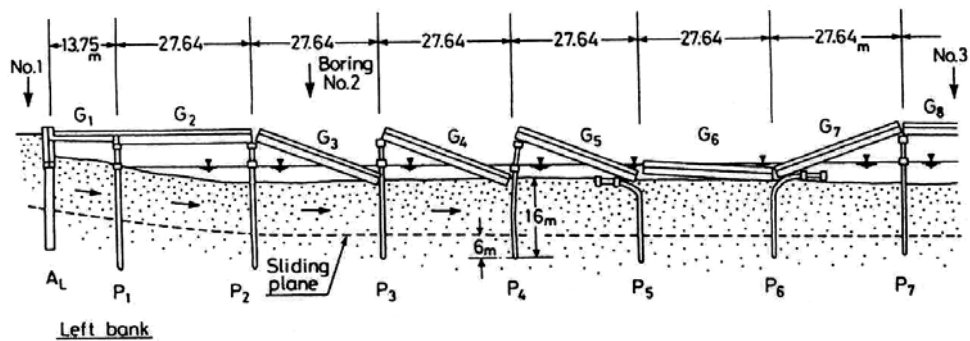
Schematic diagram of the Fall-off of the girders in Showa bridge (Takata et al., 1965).
